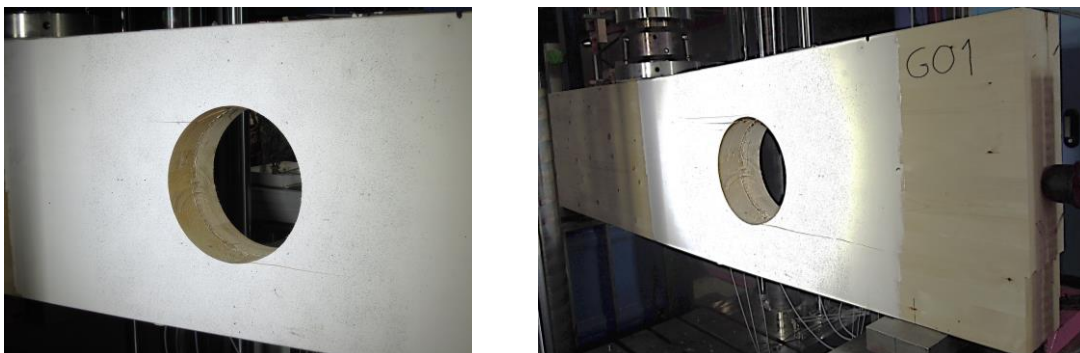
Initial and second crack in the opening area (left); shear failure with multiple cracks around the opening (right) of test specimen G01
